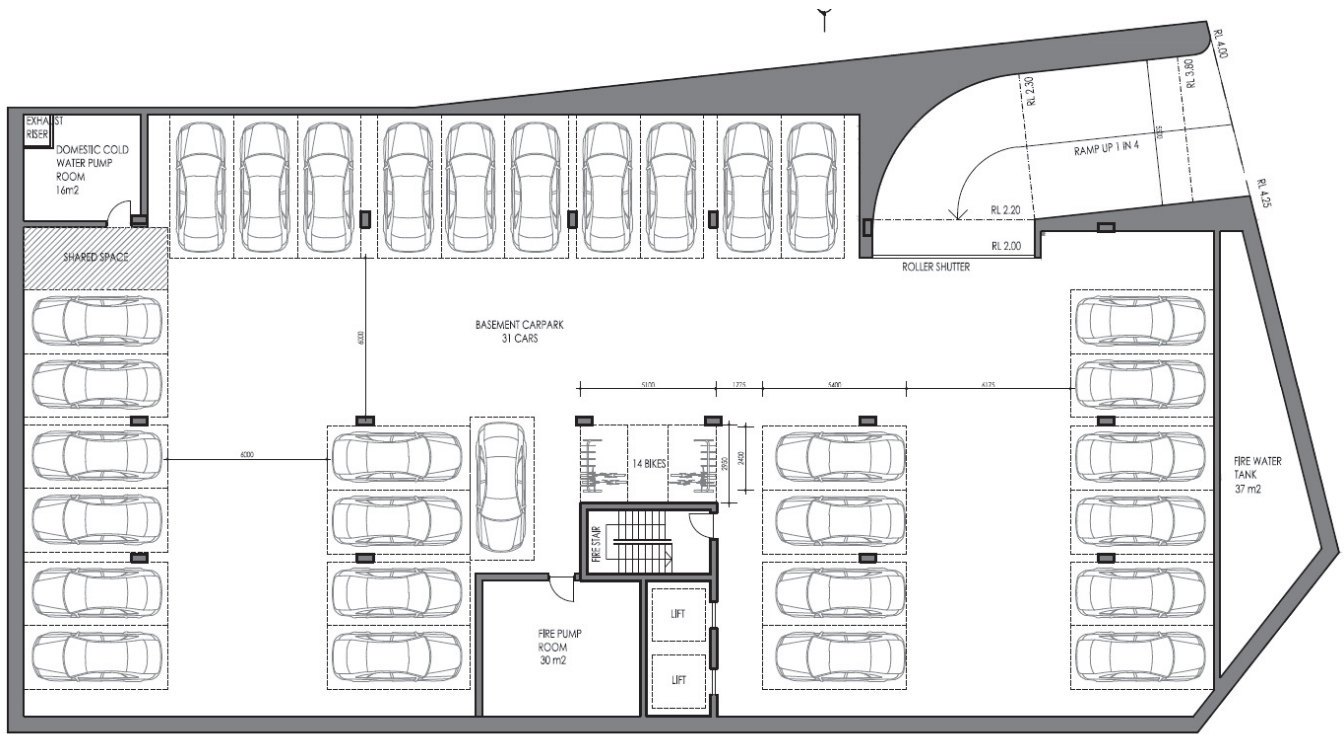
Proposed basement level parking (source: Harris-Jenkins Architects)
